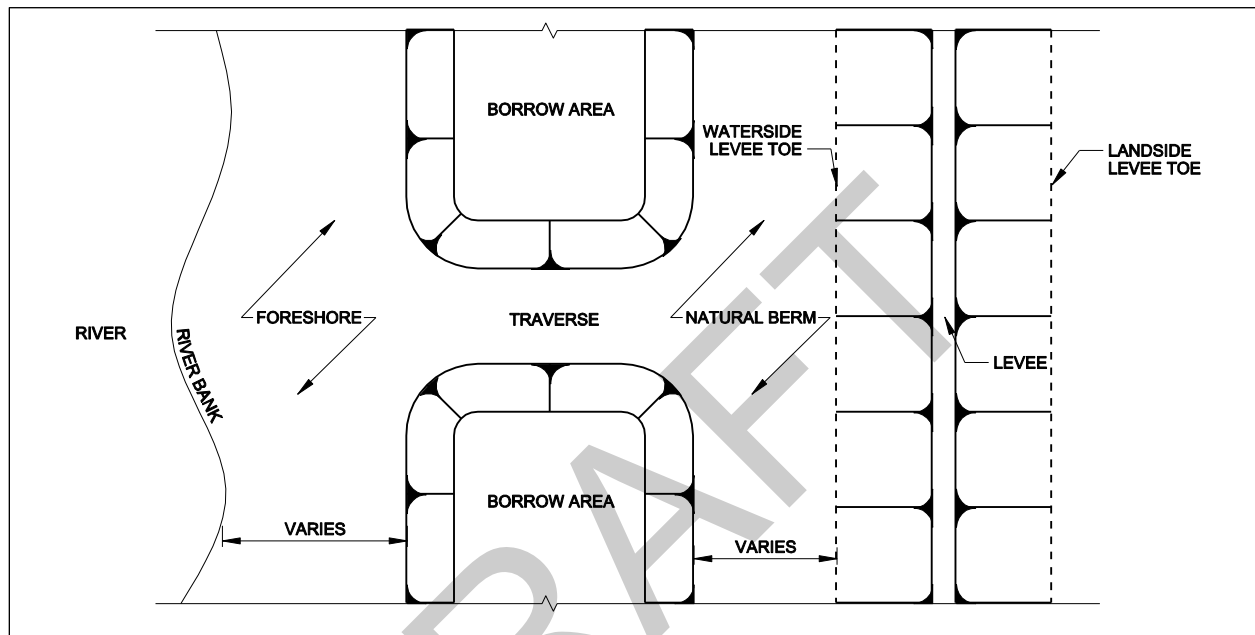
Borrow area layout showing typical levee and waterside borrow areas with traverse and foreshore. For landside borrow areas, this general layout also applies.
